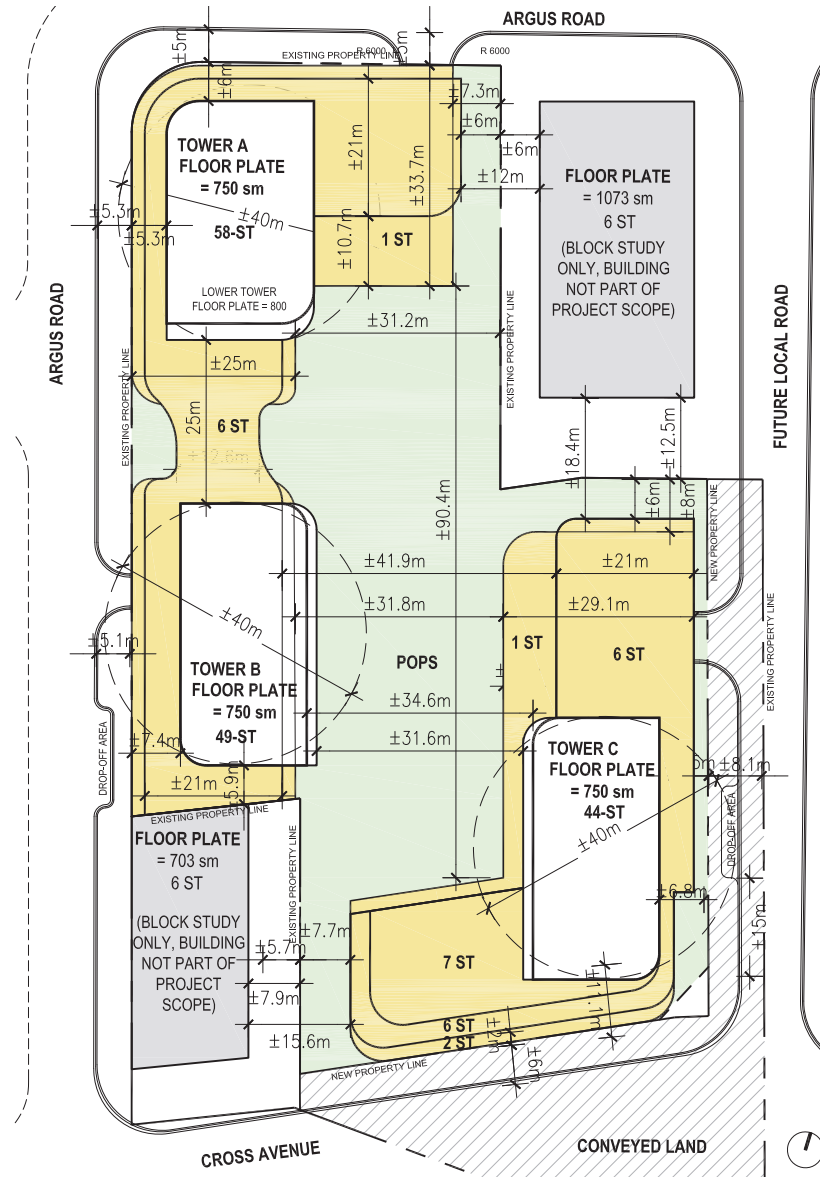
Conceptual Block Plan (Provided by BDP Quadrangle Architects)
